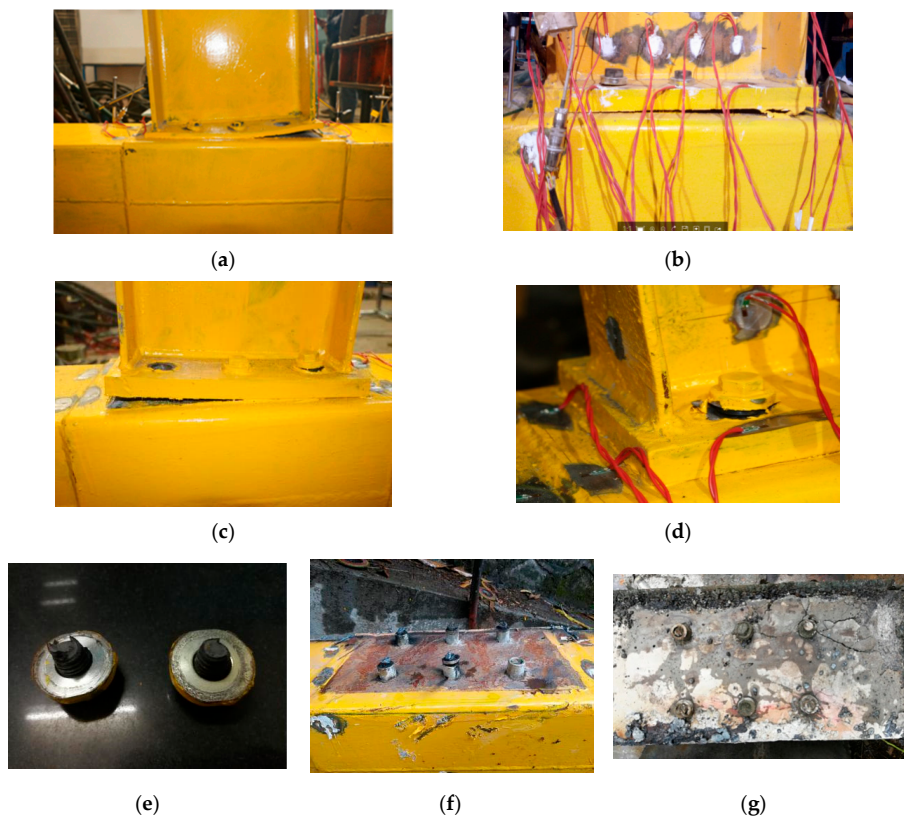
Failure mode II (specimens ST-3, ST-4, and ST-6). (a) ST-3; (b) ST-4; (c) ST-6; (d) steel beam in specimen ST-6; (e) fractured blind bolts; (f) tube wall in specimen ST-3; (g) core concrete in specimen ST-3.
